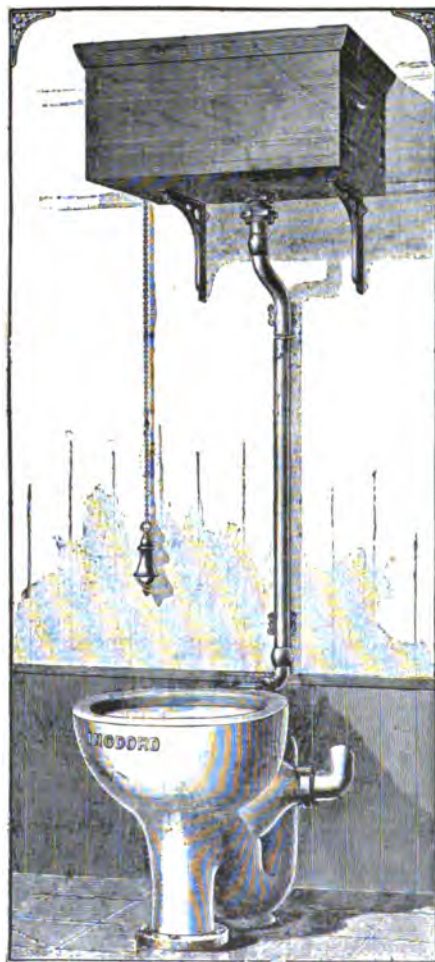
CLOSET WITH PORCELAIN TRAP ATTACHED.
